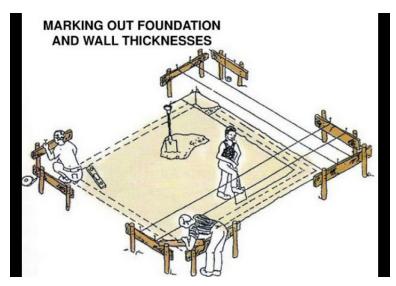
A Typical setting out process of marking out the foundation and wall thickness
